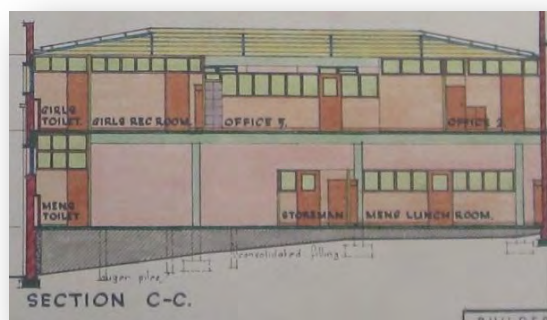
Building Permit Application drawings, section showing pitched roof behind parapet (VPRO)
